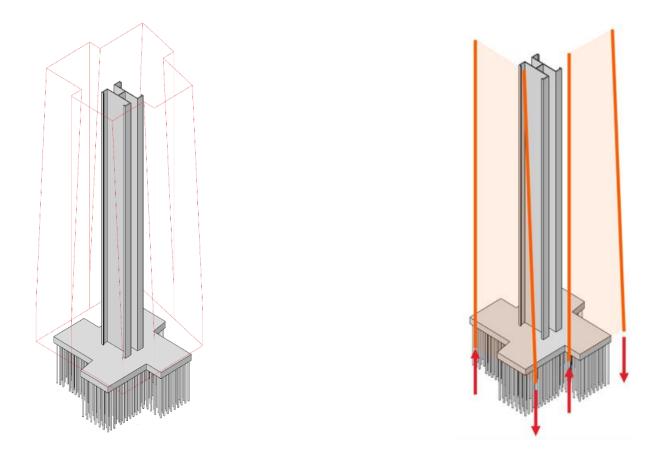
Existing core with new structure in wireframe (left); basic principles behind the new stability system (right)
